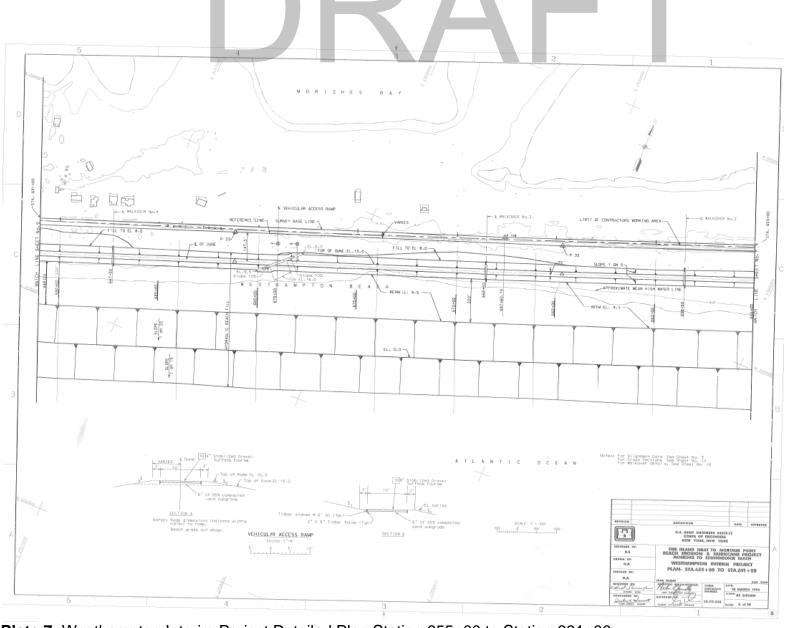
Westhampton Interim Project Detailed Plan Station 655+00 to Station 691+00
